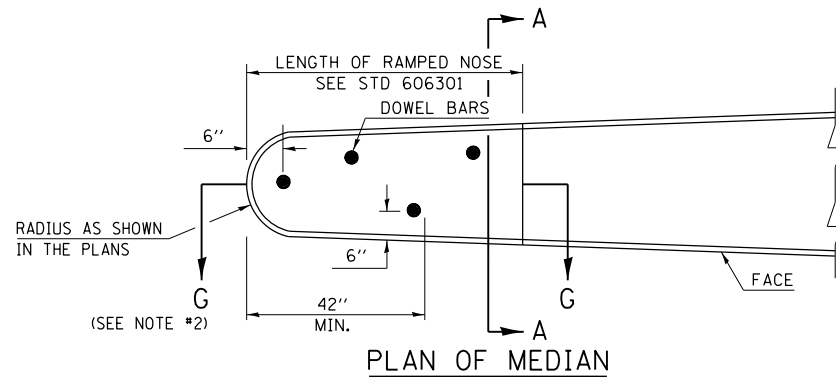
DETAIL OF CONCRETE MEDIAN, TYPE SB-6.06 (DOWELED)
